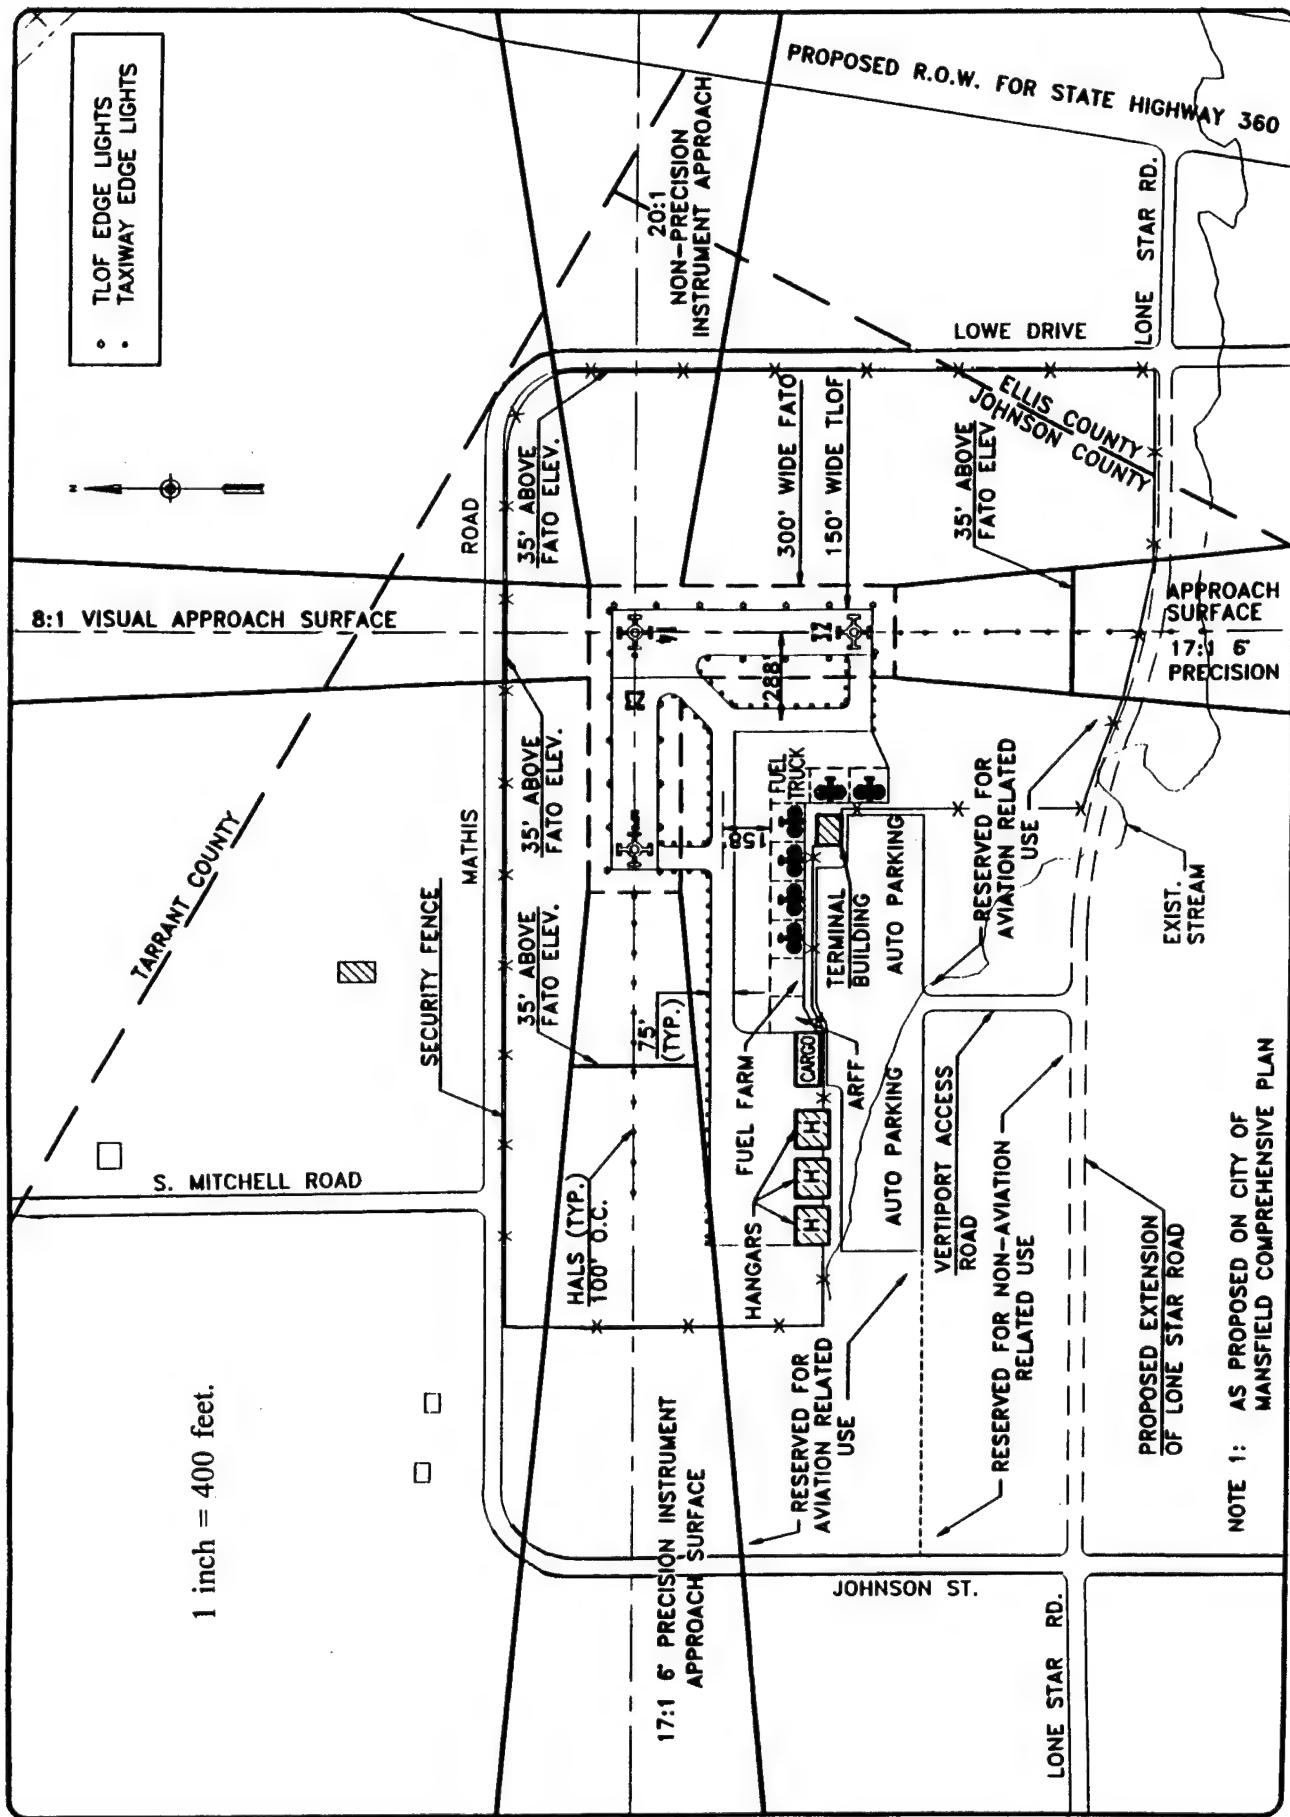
SITE PLAN - NEW VERTIPORT, MANSFIELD, TEXAS
